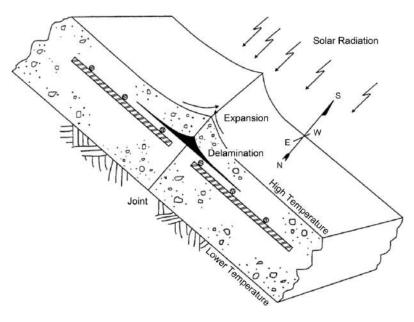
Concrete delamination due to thermal expansion (Reclamation, 1997).
